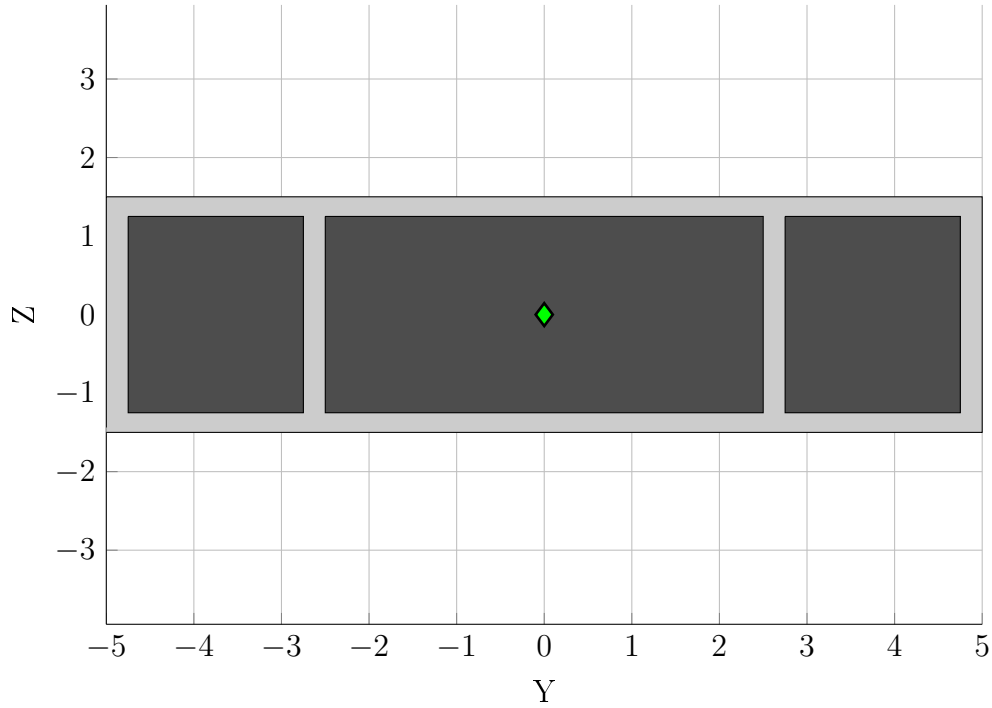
Section 1 - Rectangular section used in the benchmarks
